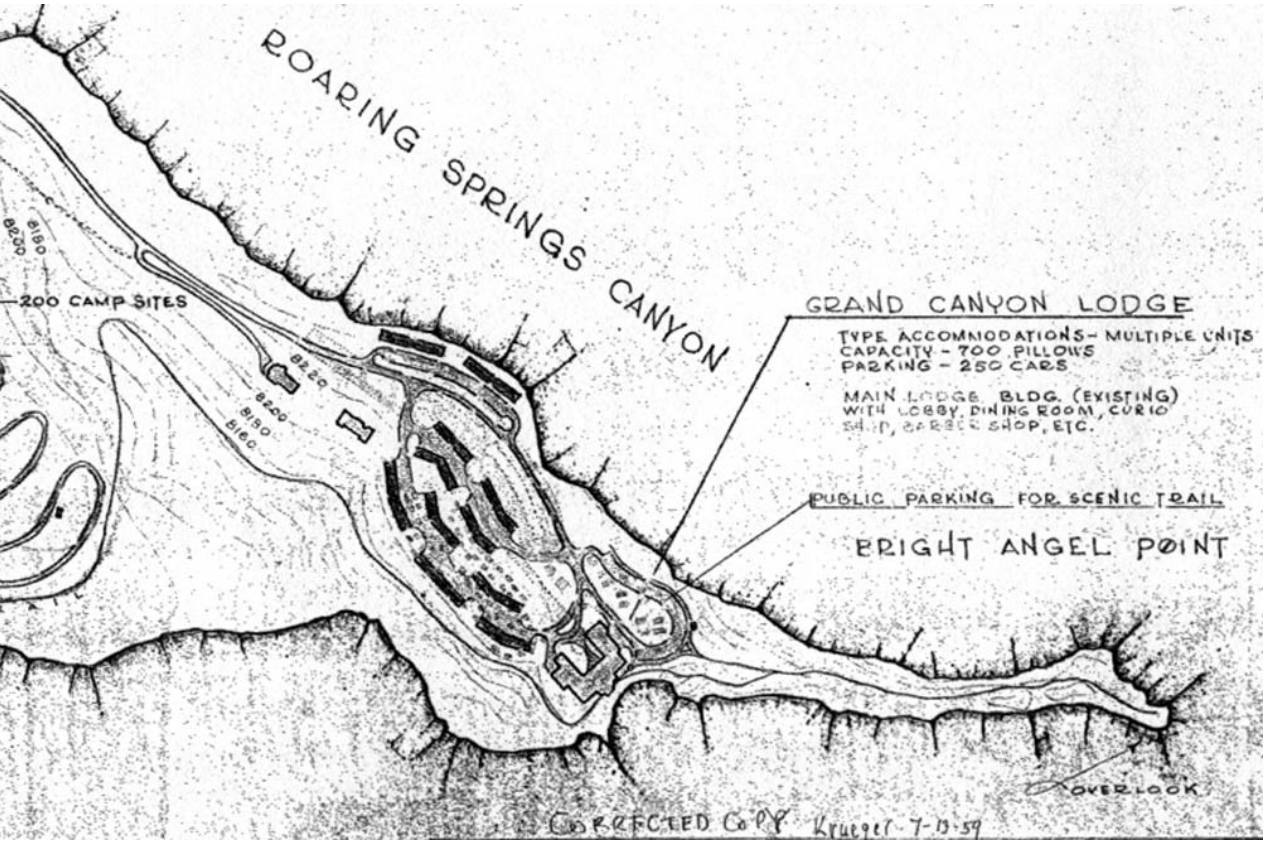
Master Plan for the development of Bright Angel Peninsula. (GRCA Collection Catalog #26769)
